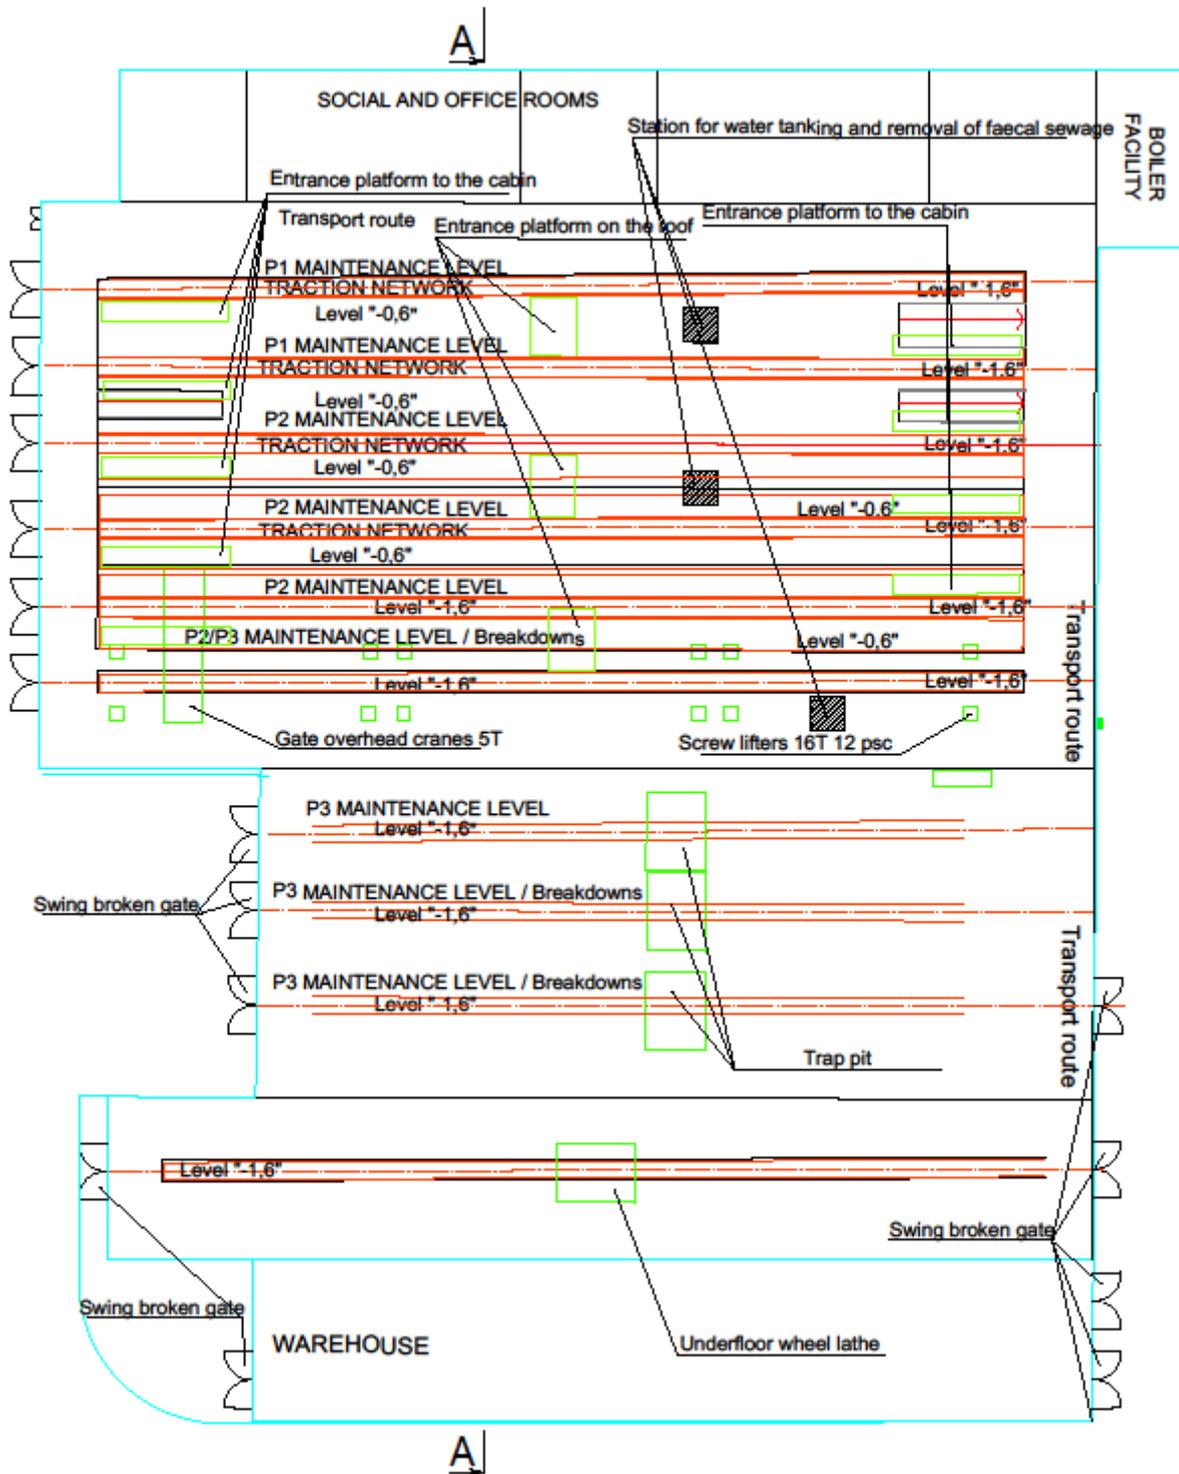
Rolling Stock Repair and Operation Section in Sochaczew - Cross section of the existing inspection and repair room with proposed stations.
